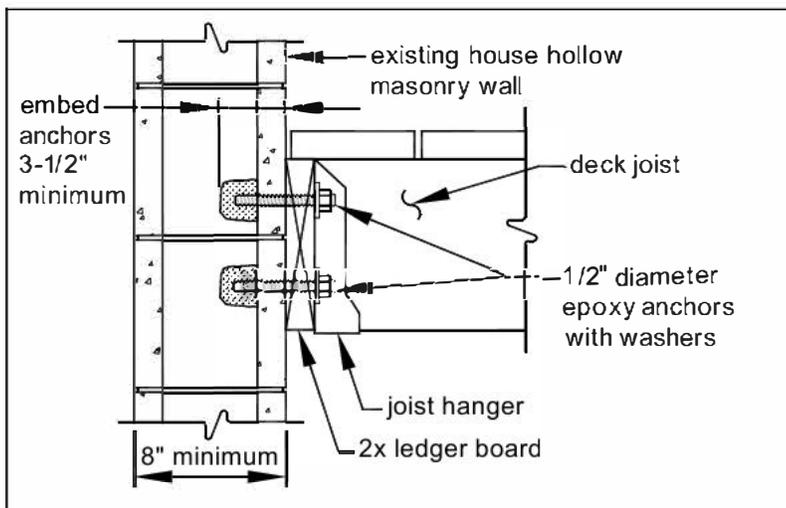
ATTACHMENT OF LEDGER BOARD-TO-FOUNDATION WALL (HOLLOW MASONRY)
